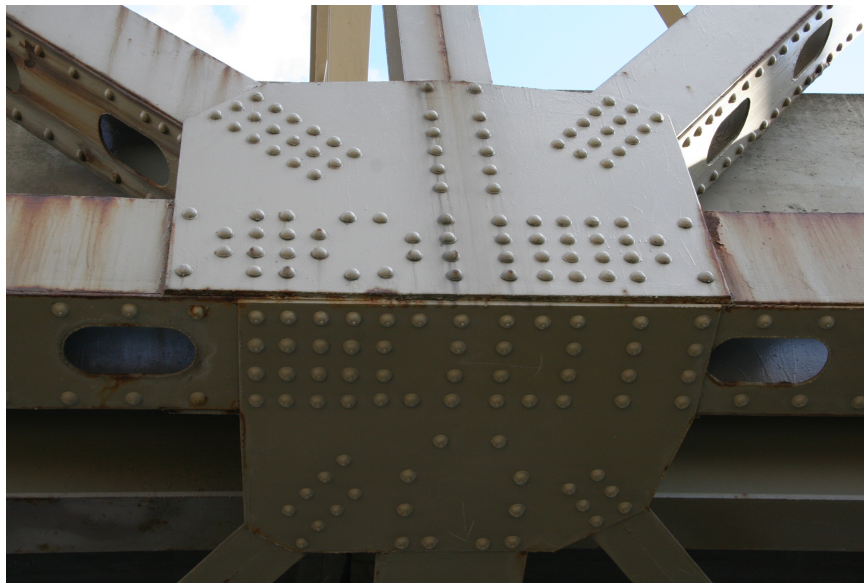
Configuration of gusset plate joint which connects planar truss member by dual gusset plates and lateral bracing by a wind gusset plate
